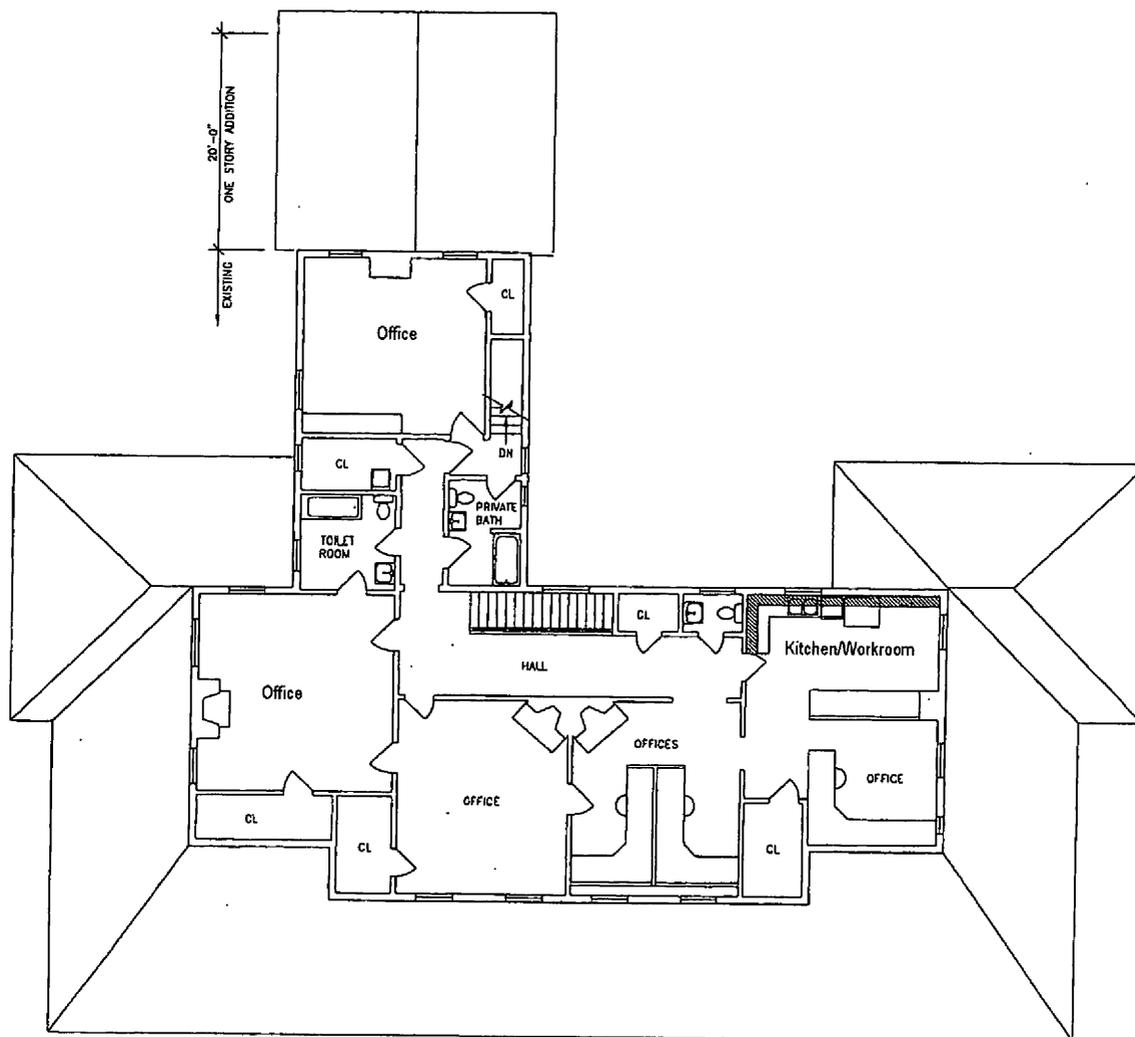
Krippendorf Lodge Renovations, Second Floor Plan, Humpert Wolnitzek Architects, Dec. 19, 2000
